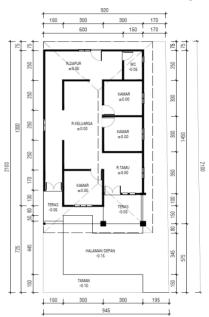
The existing floor plan of Mr. Badri's house Source: Authors, 2023
